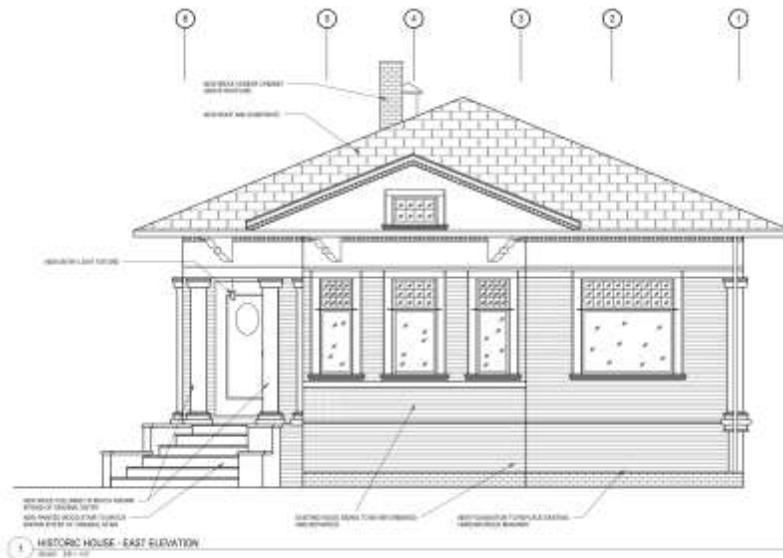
Front or East Elevation facing North Mathilda Avenue showing restored porch
